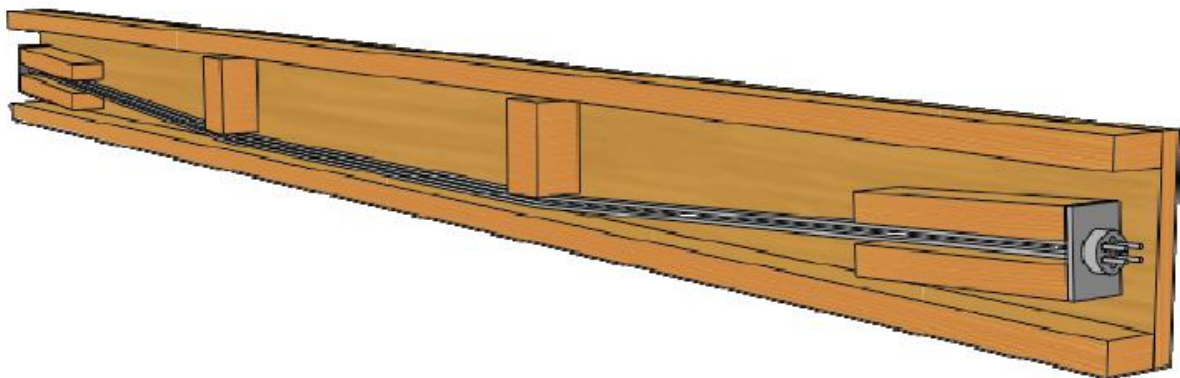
Longitudinal section of timber box beams with draped post-tensioning tendons (van Beerschoten et al., 2012).
